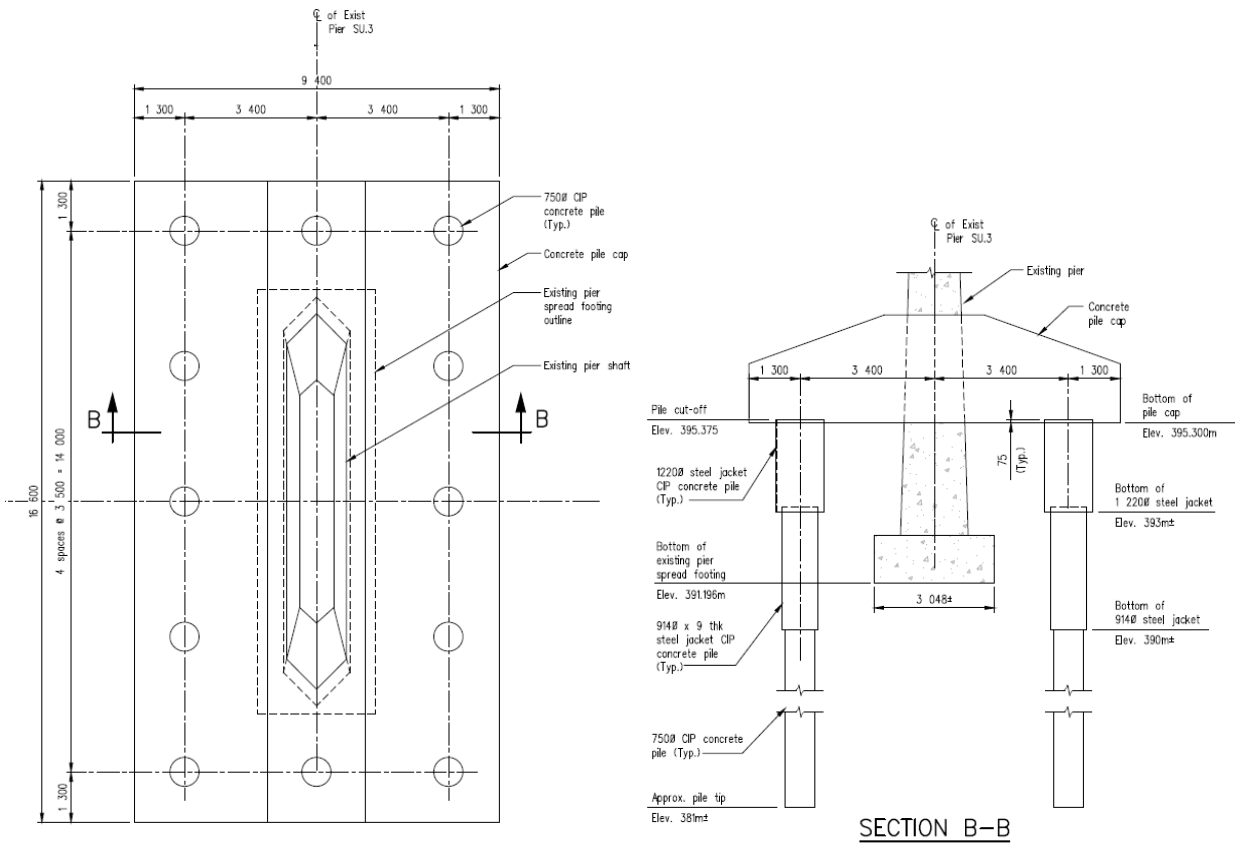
Plan and Section Views of Modified Pier Cap and Deep Foundations
